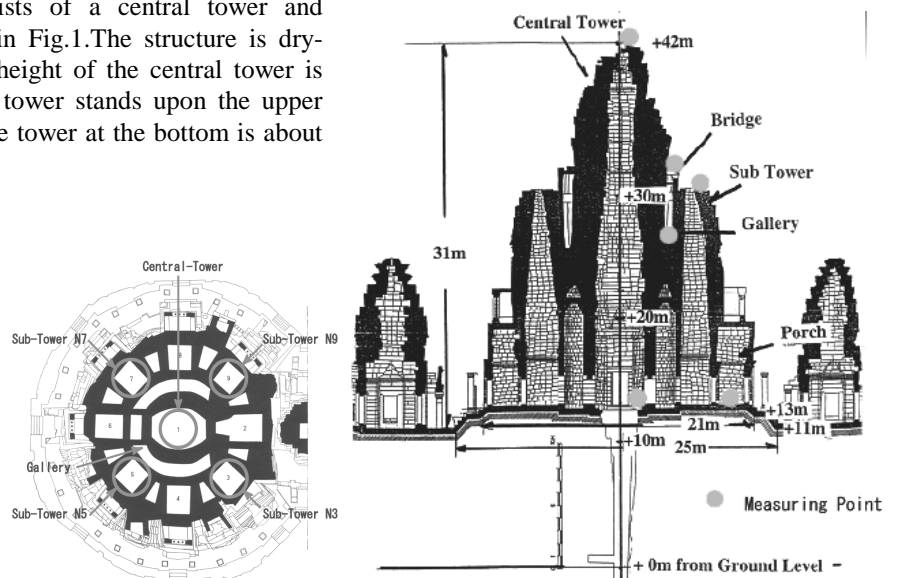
Plan and Section of the Main Tower of the Bayon temple
